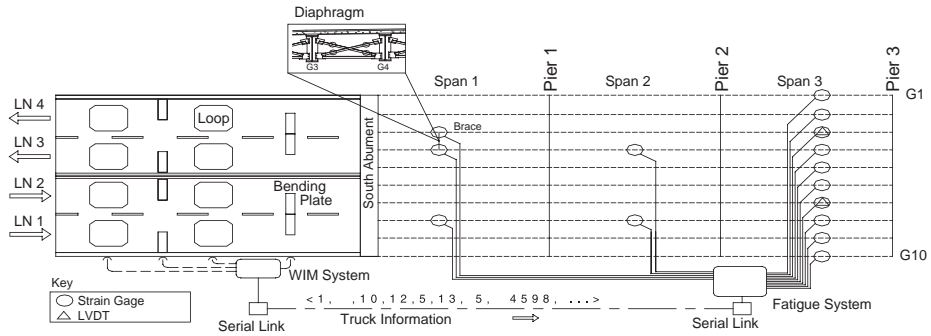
Instrumentation layout of the Doremus Avenue Bridge.
